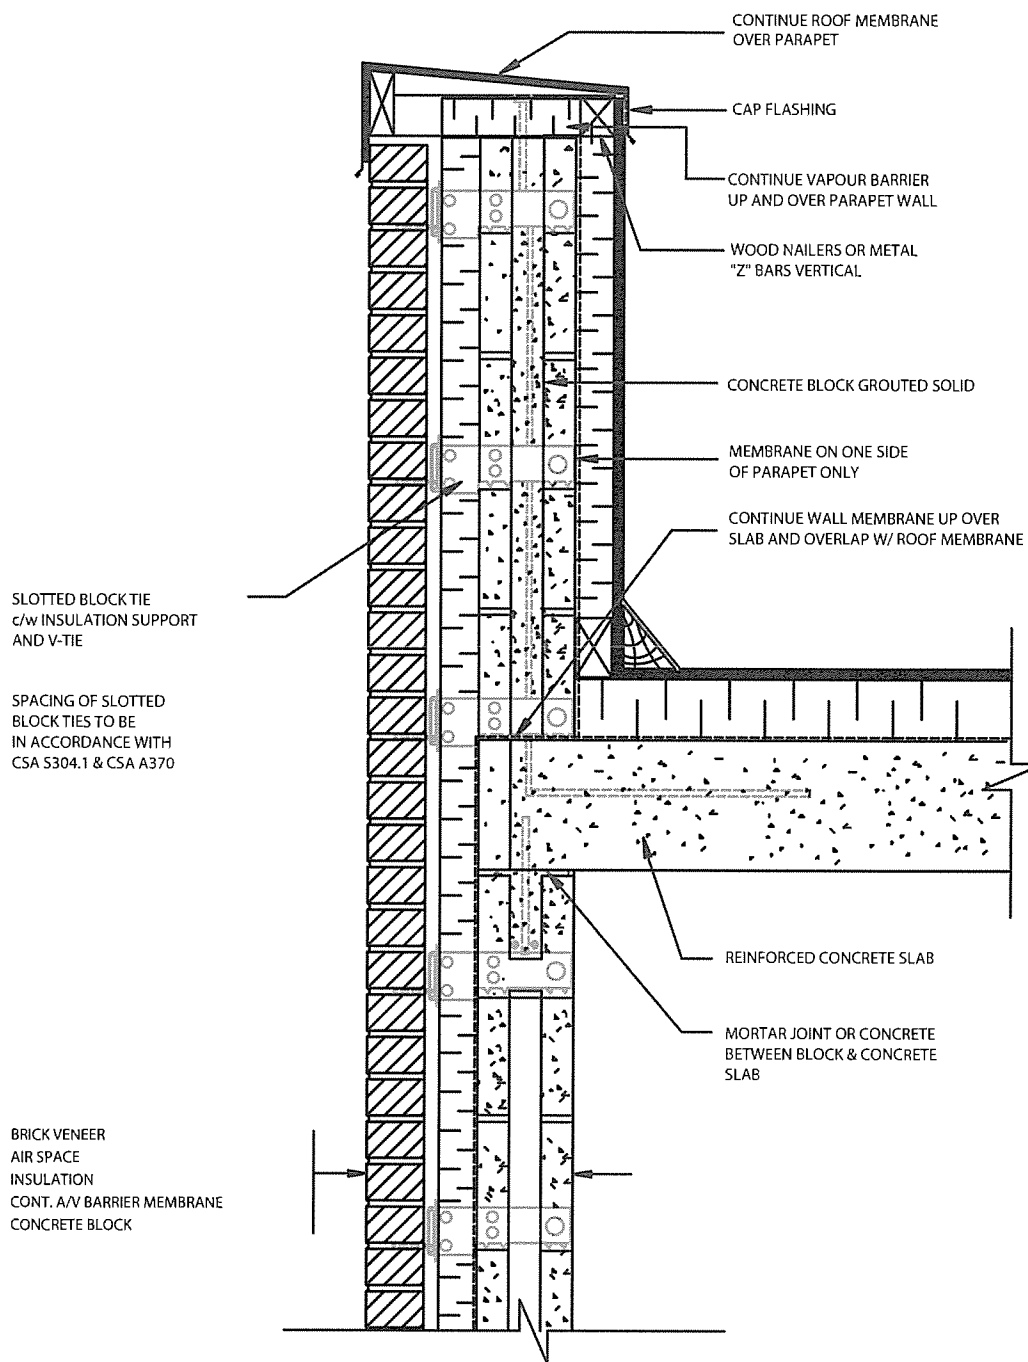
BRICK VENEER/CONCRETE BLOCK-DETAIL AT HIGH PARAPET
